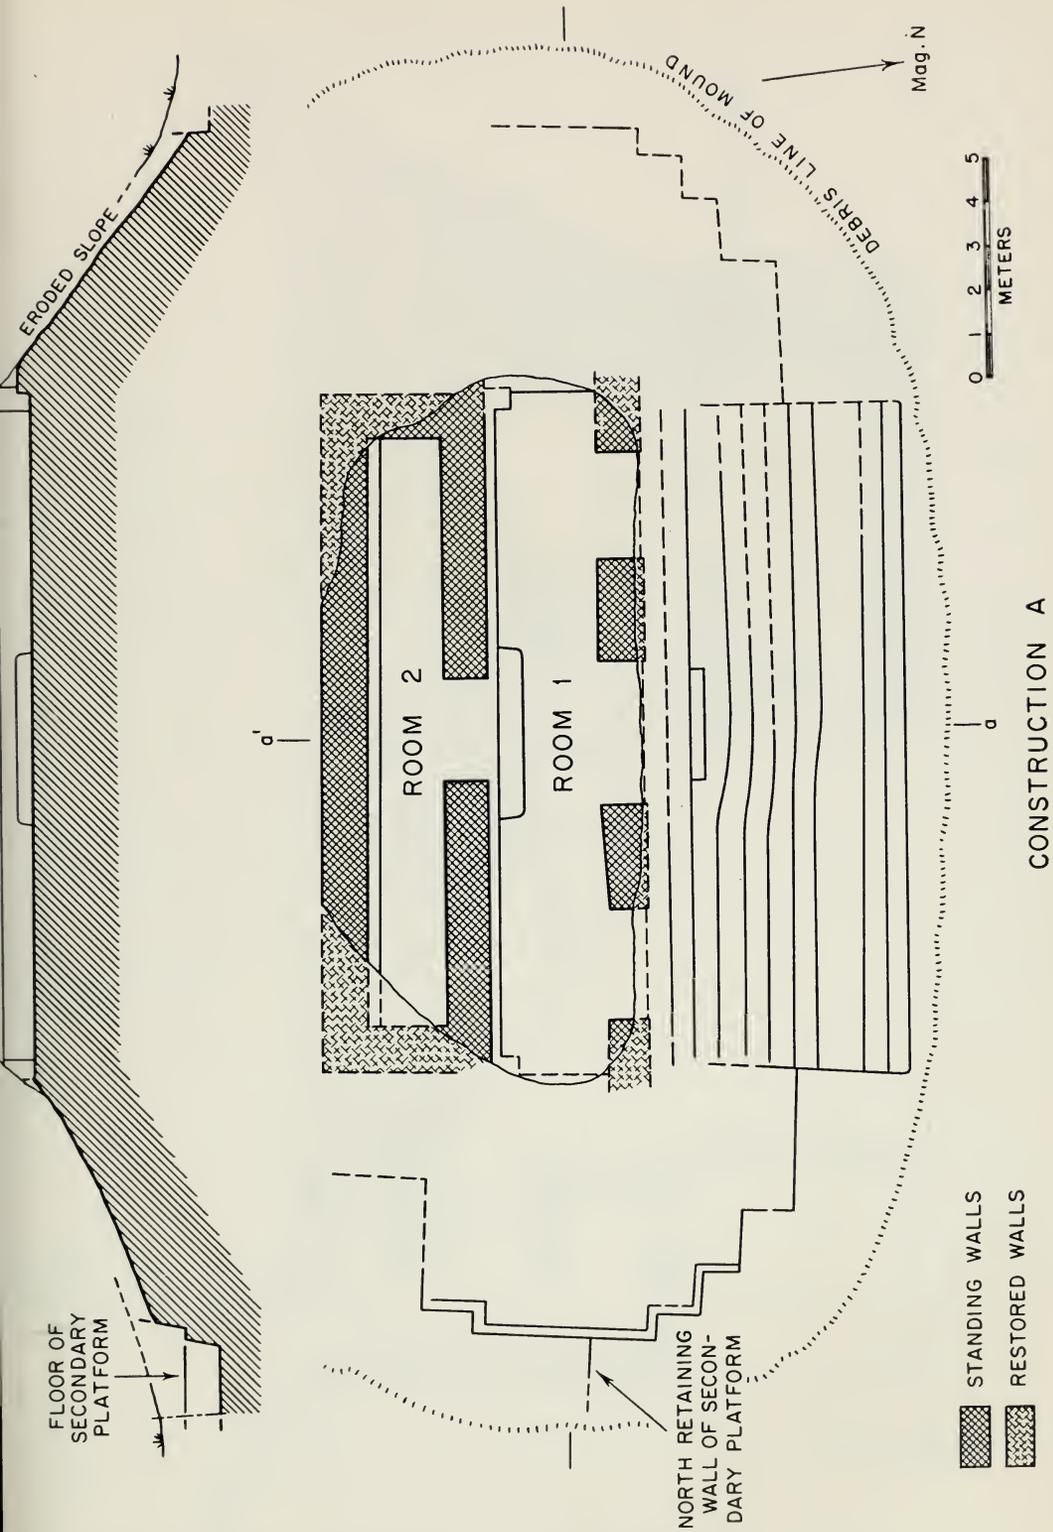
Structure I, Plan and East-West Cross-section of Construction I-A. Cross-section runs through Room 1.
